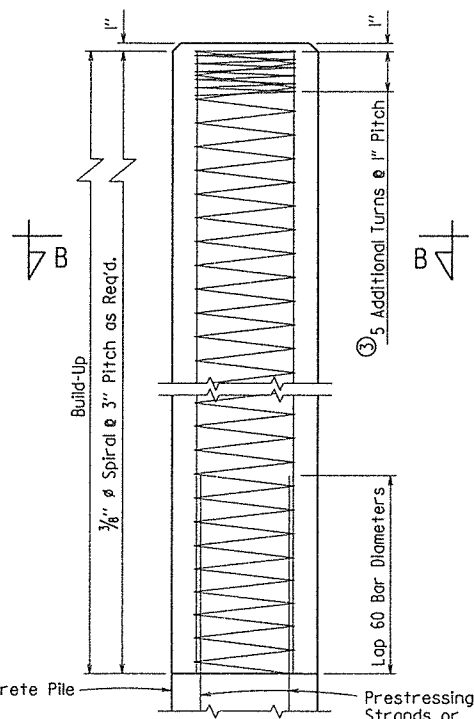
" SQUARE PRESTRESSED CONCRETE PILES
